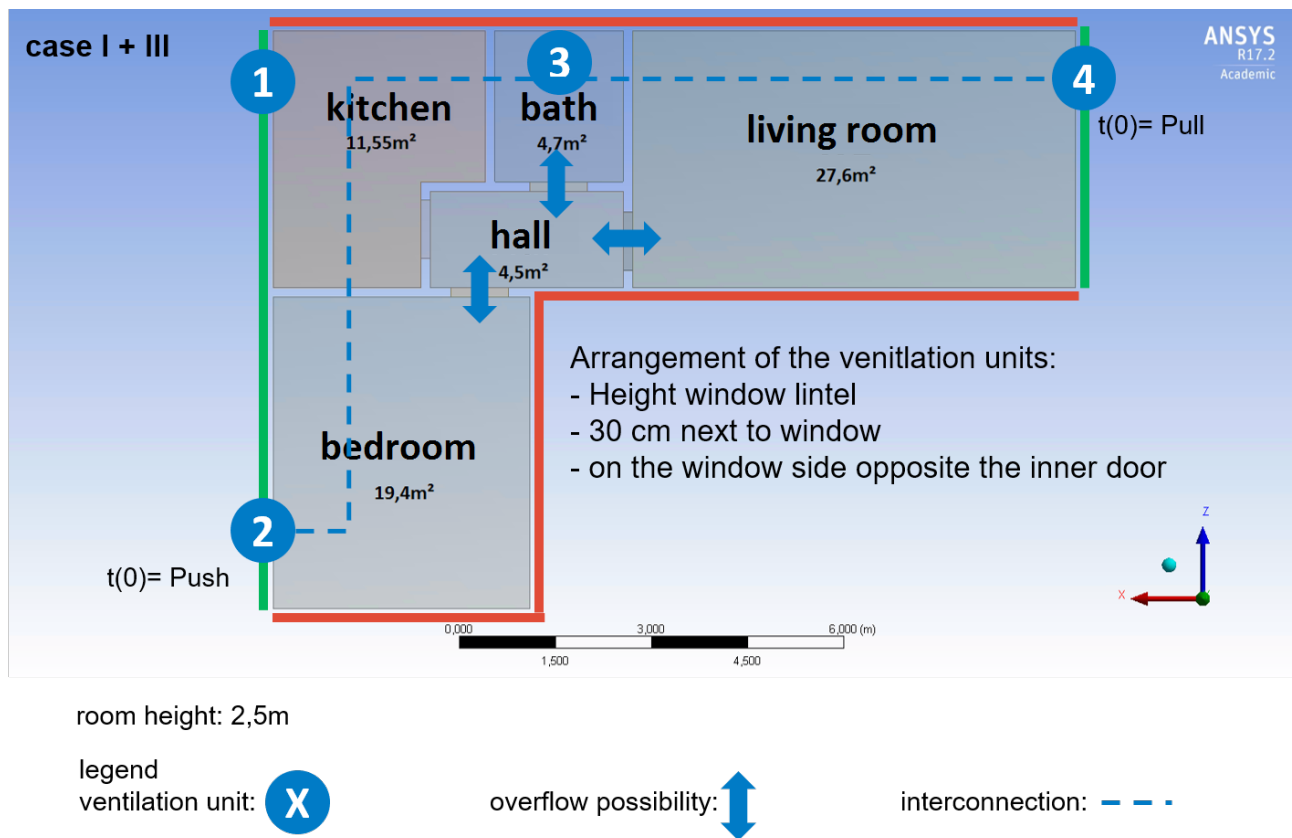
Floor plan and exemplary device constellation of the examined apartment.
